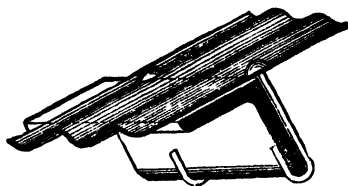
Sheets Fastened to Angle-purlin by Clinch-nails
